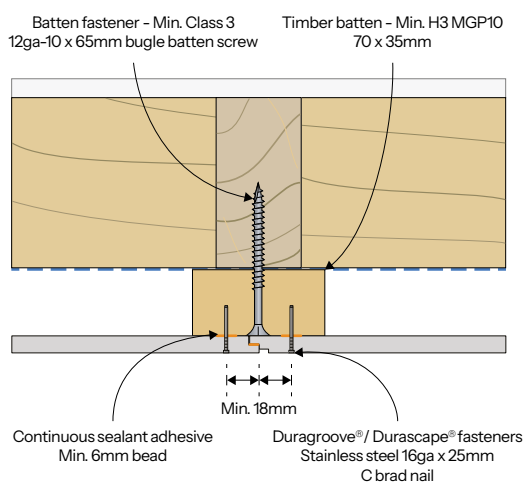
Timber frame - cavity fix (35mm) fastener detail Plan
